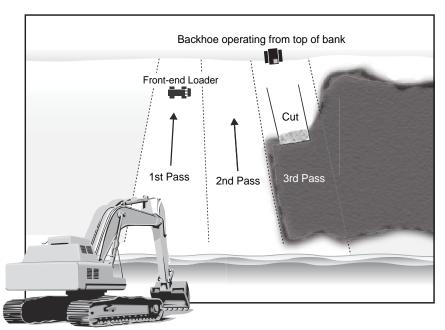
Direct Mechanical Removal Using a Backhoe
